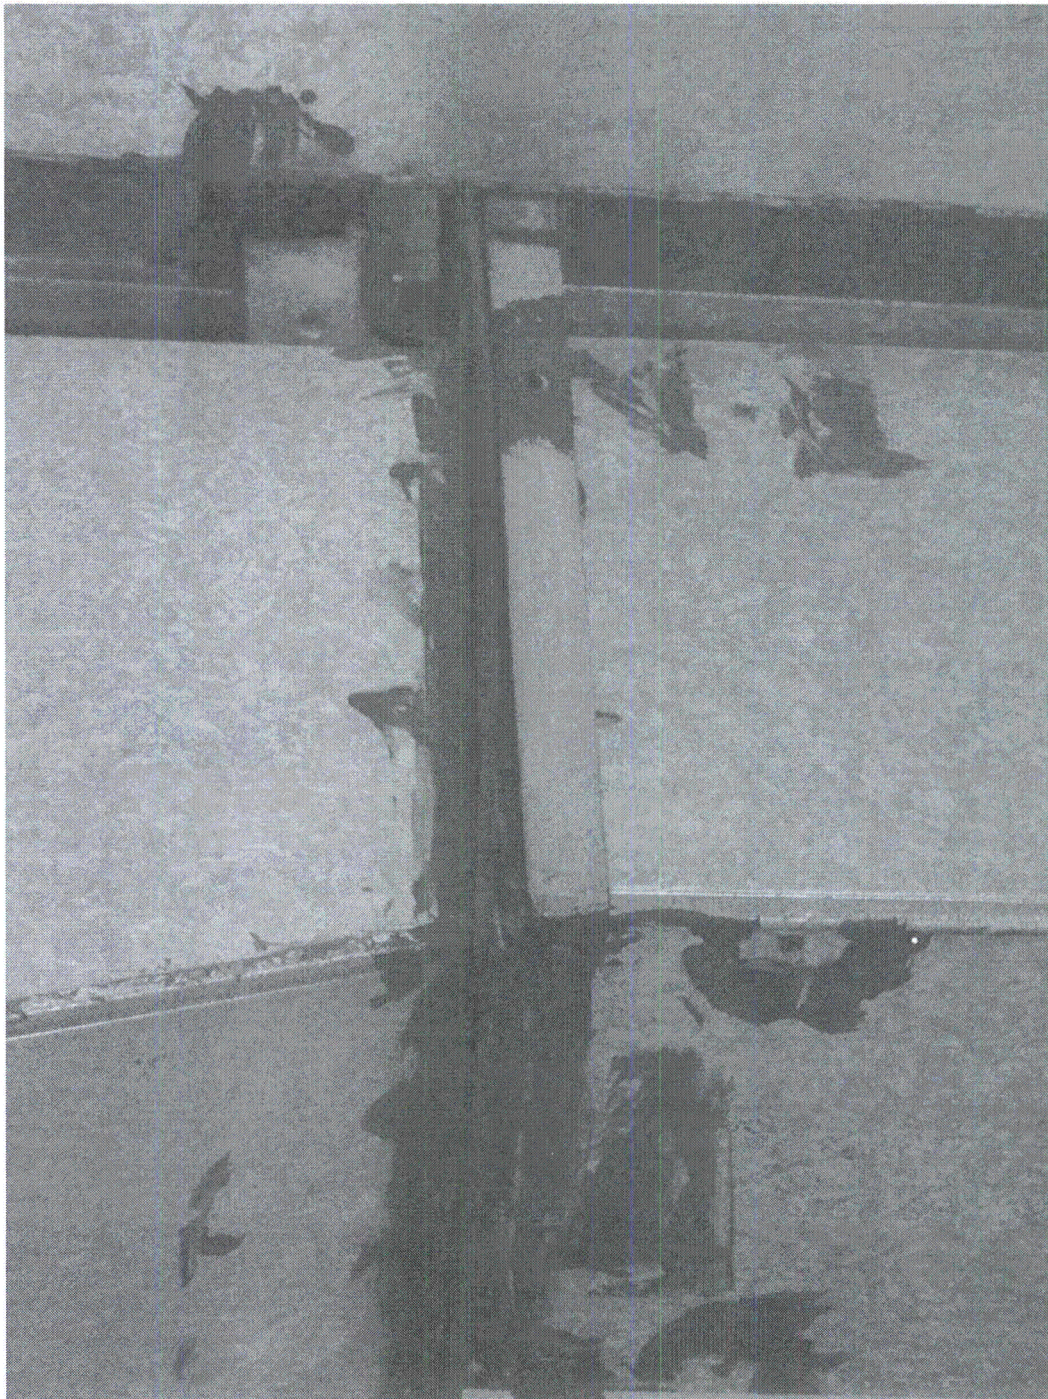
Missing Screw on HVAC Strap (Room C-027)
